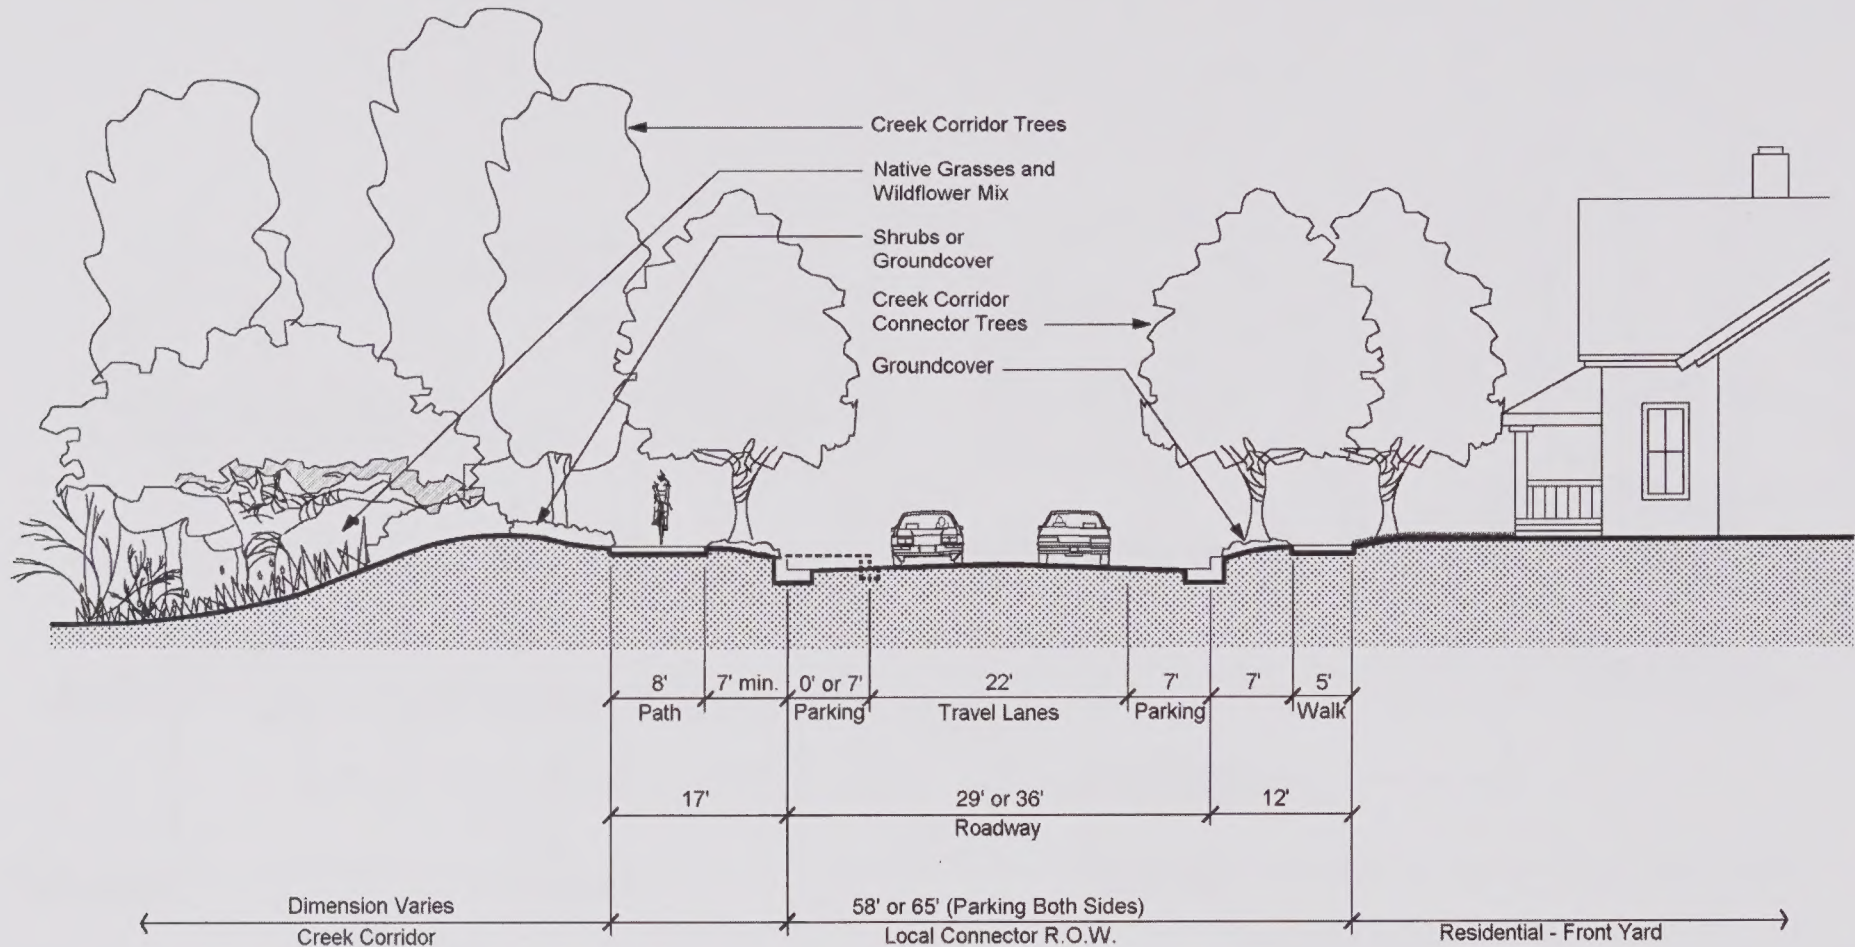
SECTION T – WATERMAN DRIVE
